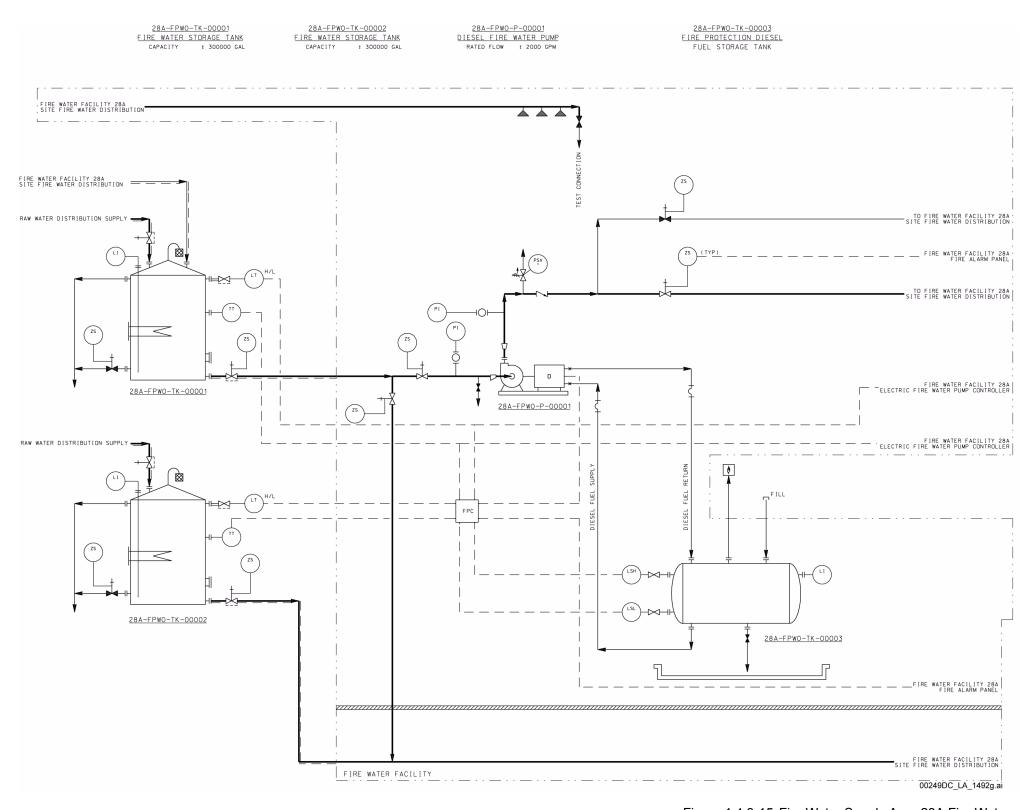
Fire Water Supply Area 28A Fire Water Storage
